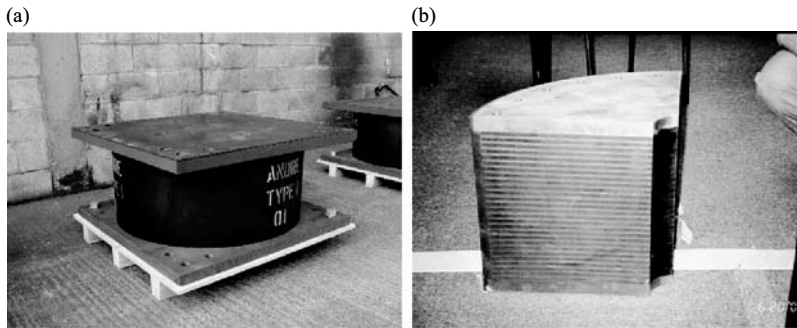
(a) High-damping natural rubber bearings manufactured by BTR Andre and (b) the section cut of tested bearing.
